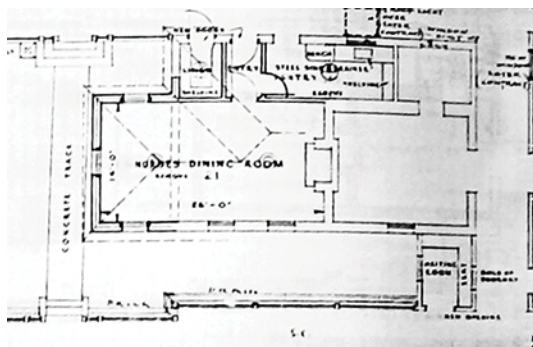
Parkes's truss detail for the nurses' accommodation building. Dubbo Base Hospital Archives
